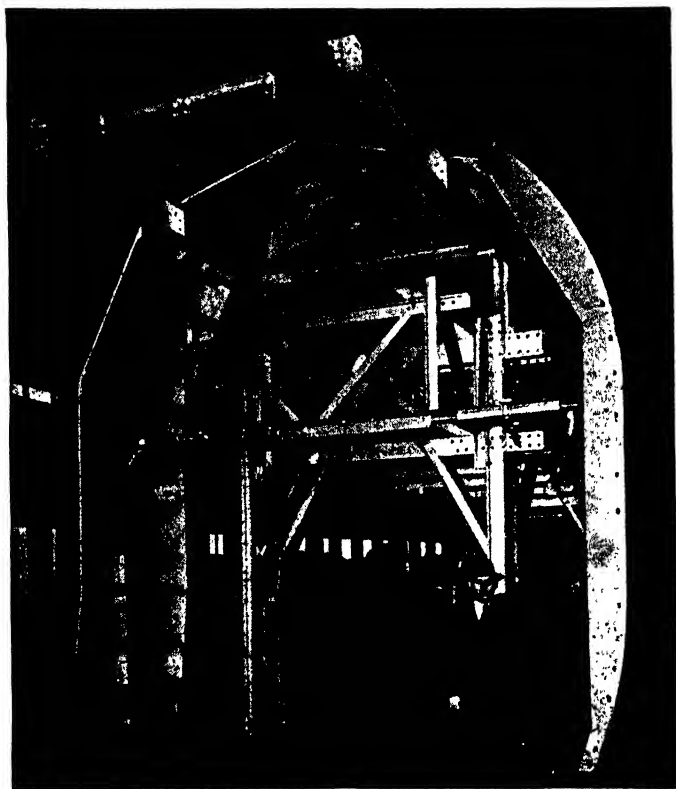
Telescoping steel forms, Chicago subways. The traveler, equipped with hydraulic jacks, runs on a wide-gage track to pass muck cars beneath.
